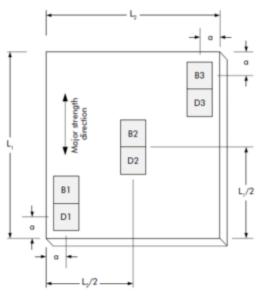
Block shear ("B") and delamination ("D") specimen locations
